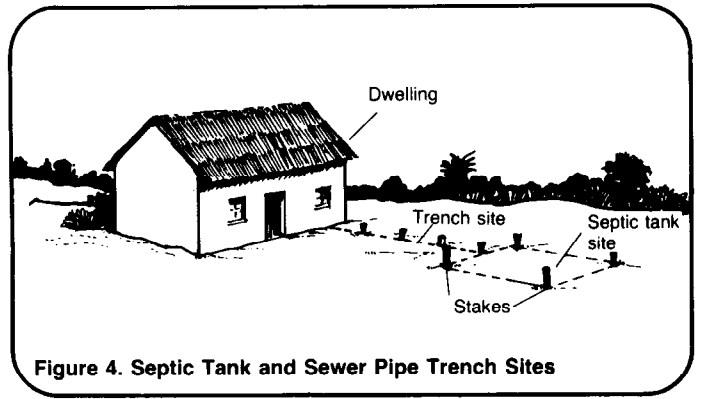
Septic Tank and Sewer Pipe Trench Sites
